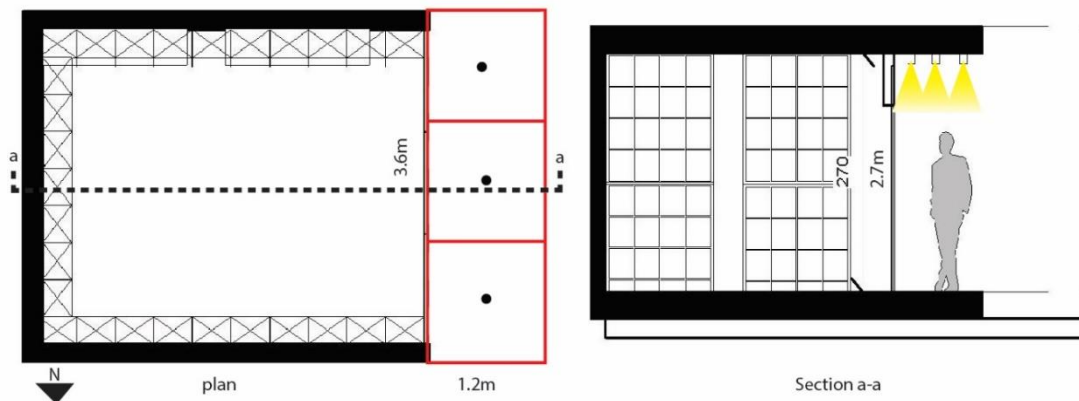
7 PLAN AND SECTION VIEW OF SHOP 1
